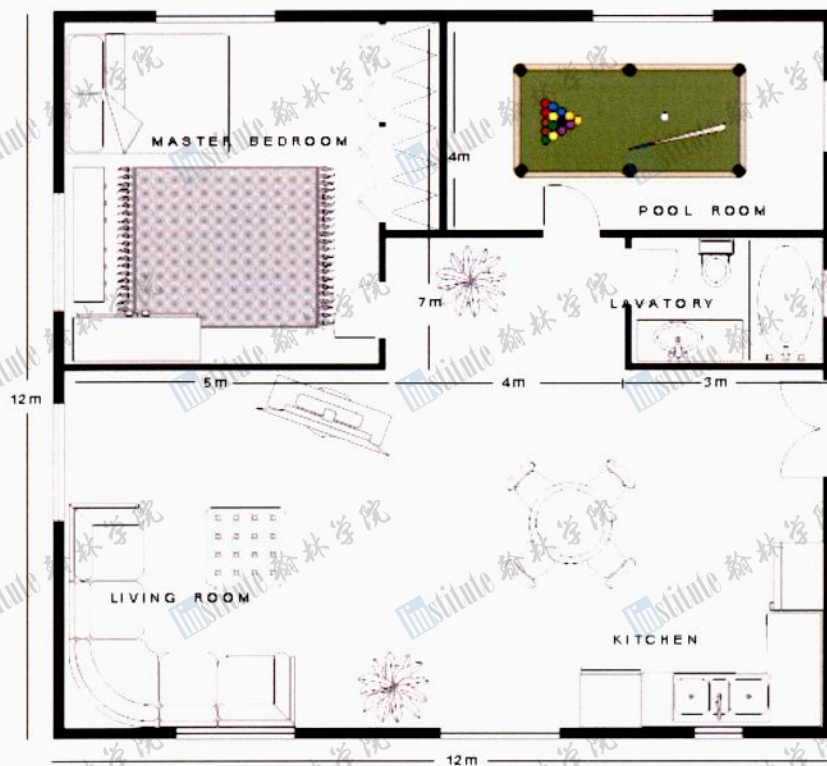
| A typical Singles Executive Transient Sector has a masterbedroom, a living room, a lavatory, a pool room and a kitchen. Area: 1500 ft² (144 m²).
